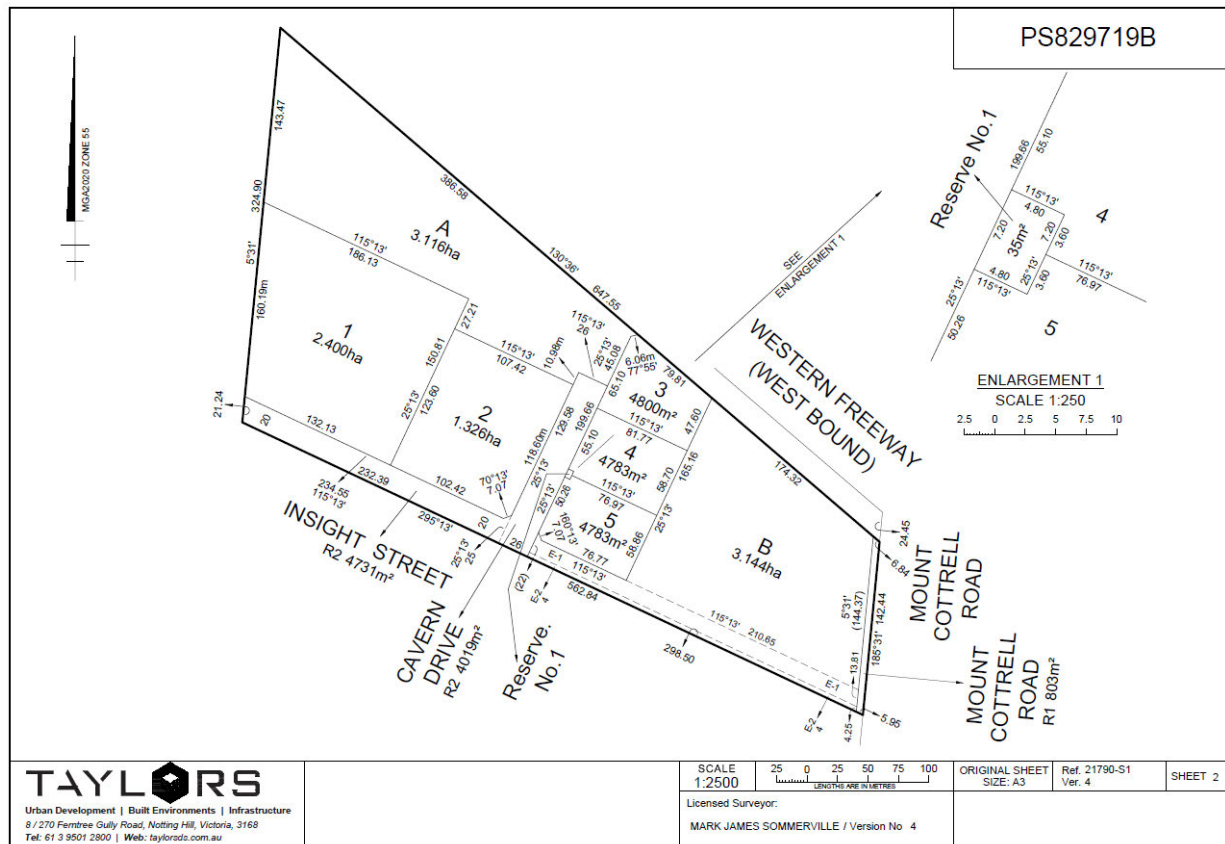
CERTIFIED PLAN OF SUBDIVISION (PS829719B)
